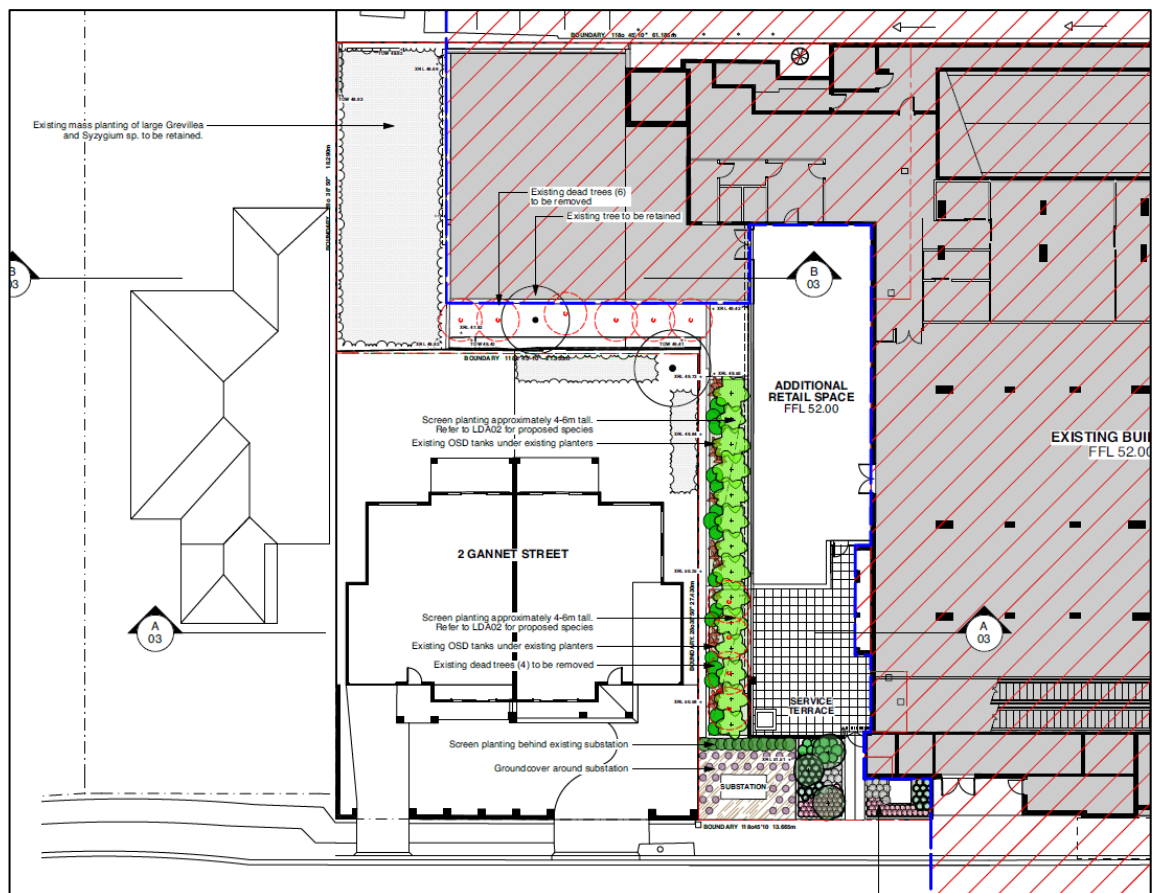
Amended landscape plan showing screen planting only proposed on the western boundary
